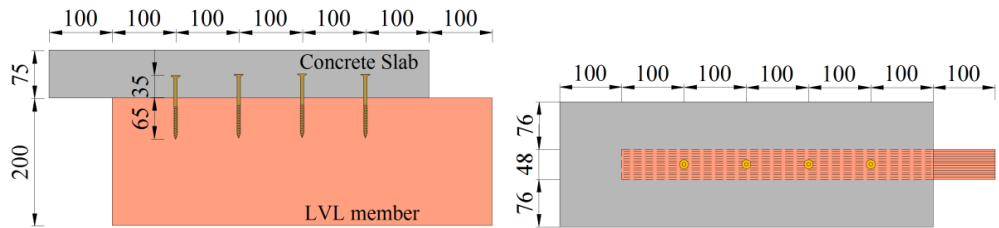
4WS spaced at 100mm specimen: (a) cross-section, (b) plan view (in mm)
